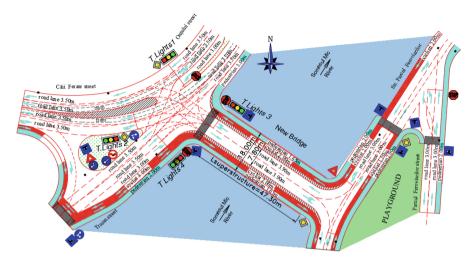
Plan view of the Bridge with two carriage-lanes [1].
